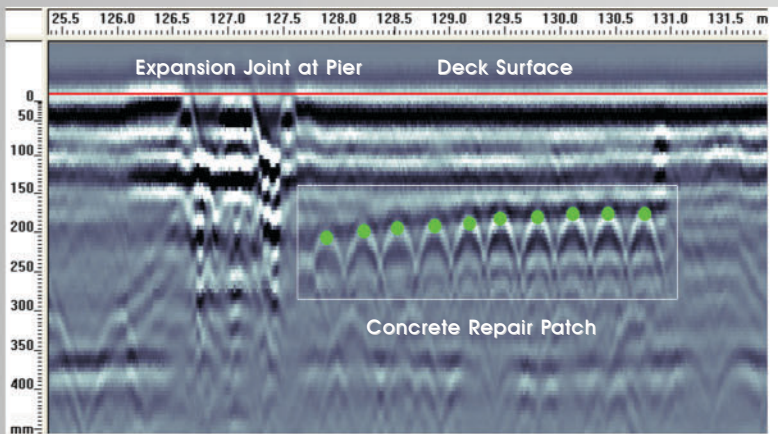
The 1000 MHz systems provide high resolution imaging of reinforcement and conduits in concrete structures.
